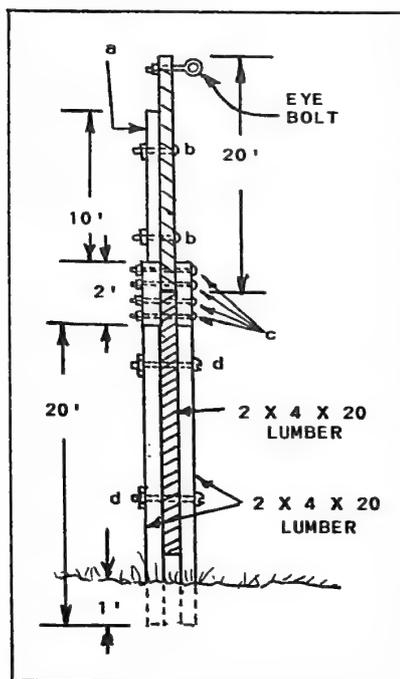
Details for 40-foot mast made from 2 X 4-inch lumber. Four 20-foot lengths of 2 X 4 lumber are used. Section "a" is a 15-foot piece of 2 X 2 inch lumber. It serves as a stiffener for the top 2 X 4 piece. Bolts "b" are 3/8 X 6-inch carriage types with washers under the bolt head and nut. Item "c" is a 3/8 X 8-inch carriage bolt, nut and two washers. Part "d" is a 1/2 X 8-inch carriage bolt, nut and two washers. Two 2-foot pieces of 2 X 4 lumber serve as joiners for the 20-foot sections. They are secured with four bolts ("c"). Weatherproof pressure-treated lumber is best for longevity. Untreated lumber may be used if it is well painted or varnished. The portion in the ground needs to be treated against dry rot and termite damage. Compounds such as Cuprinol may be used for this purpose.
